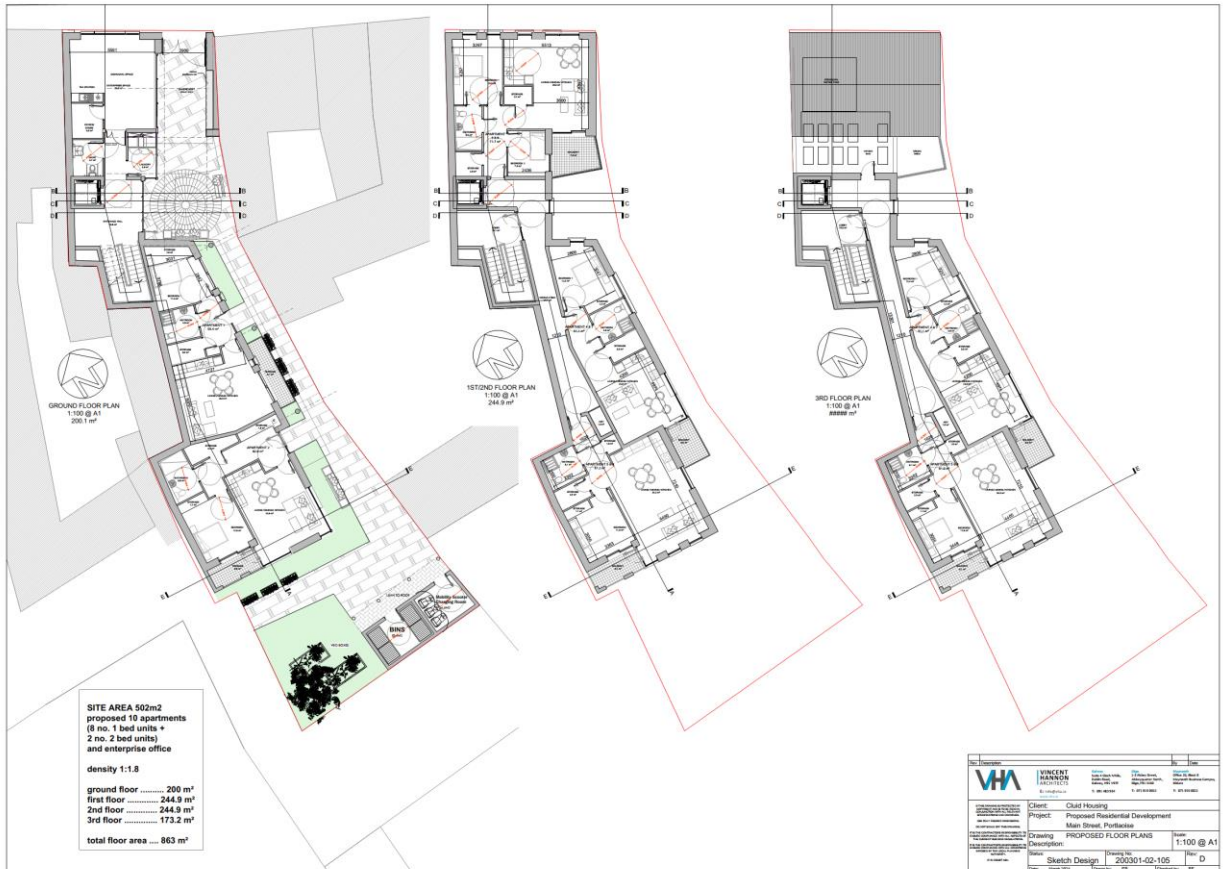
Proposed Development Layout, VHA drawing 200301-02-105
